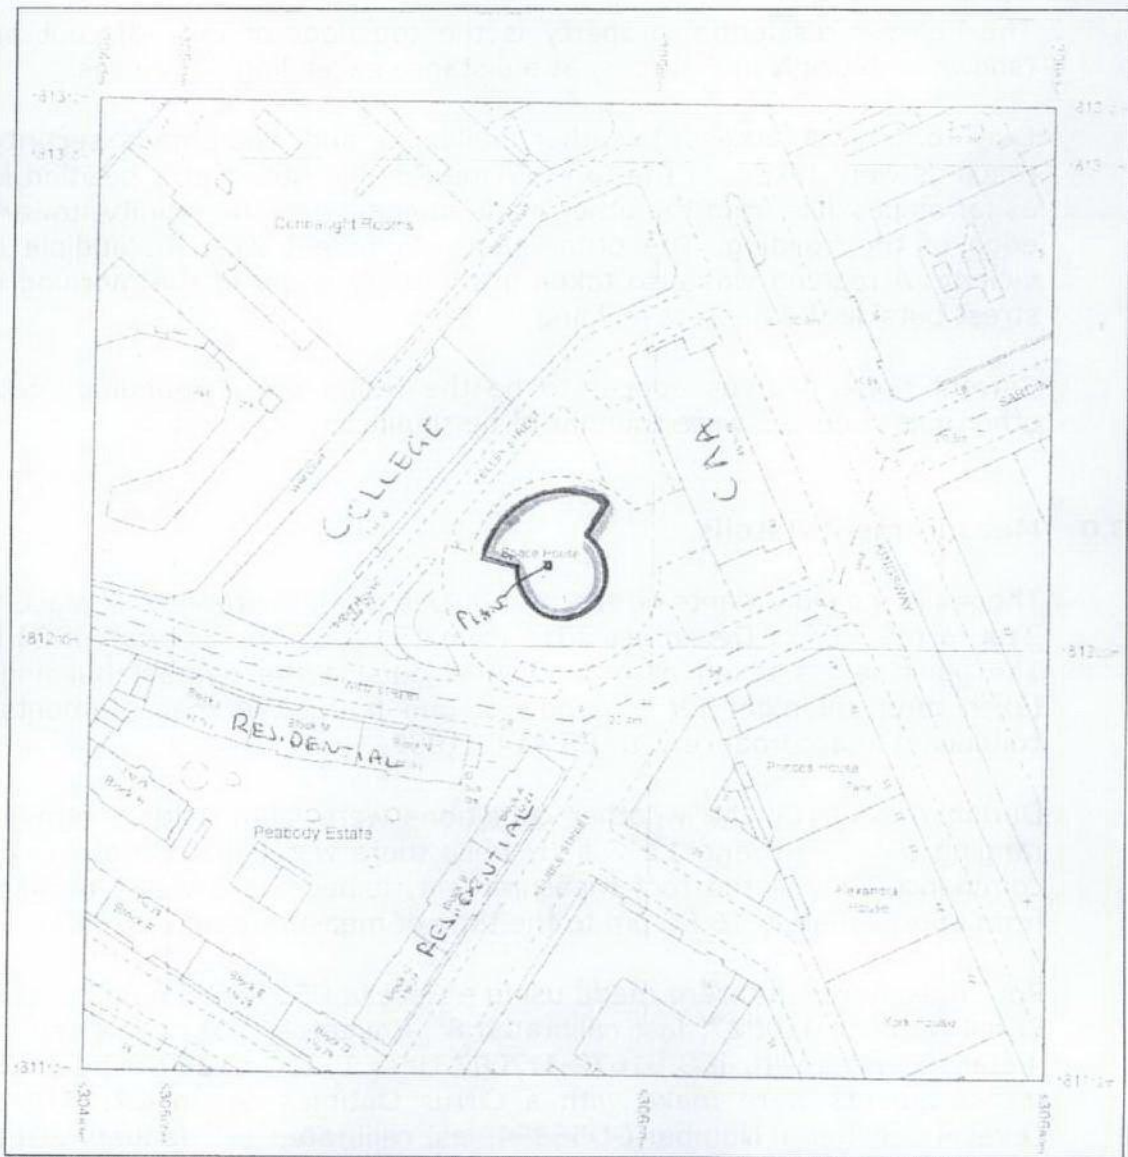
Plan view drawing indicating the position of the proposed plant and closest offices and buildings
